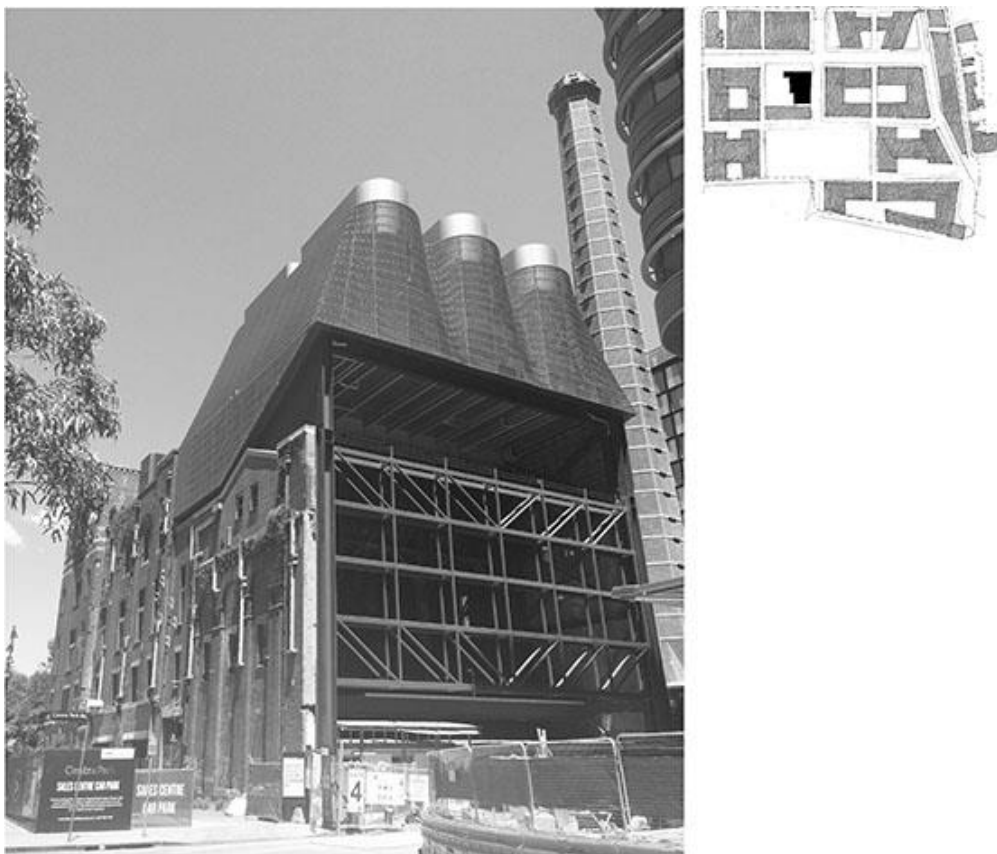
Tri-generation cooling towers on top of retained brewery building, Central Park.
